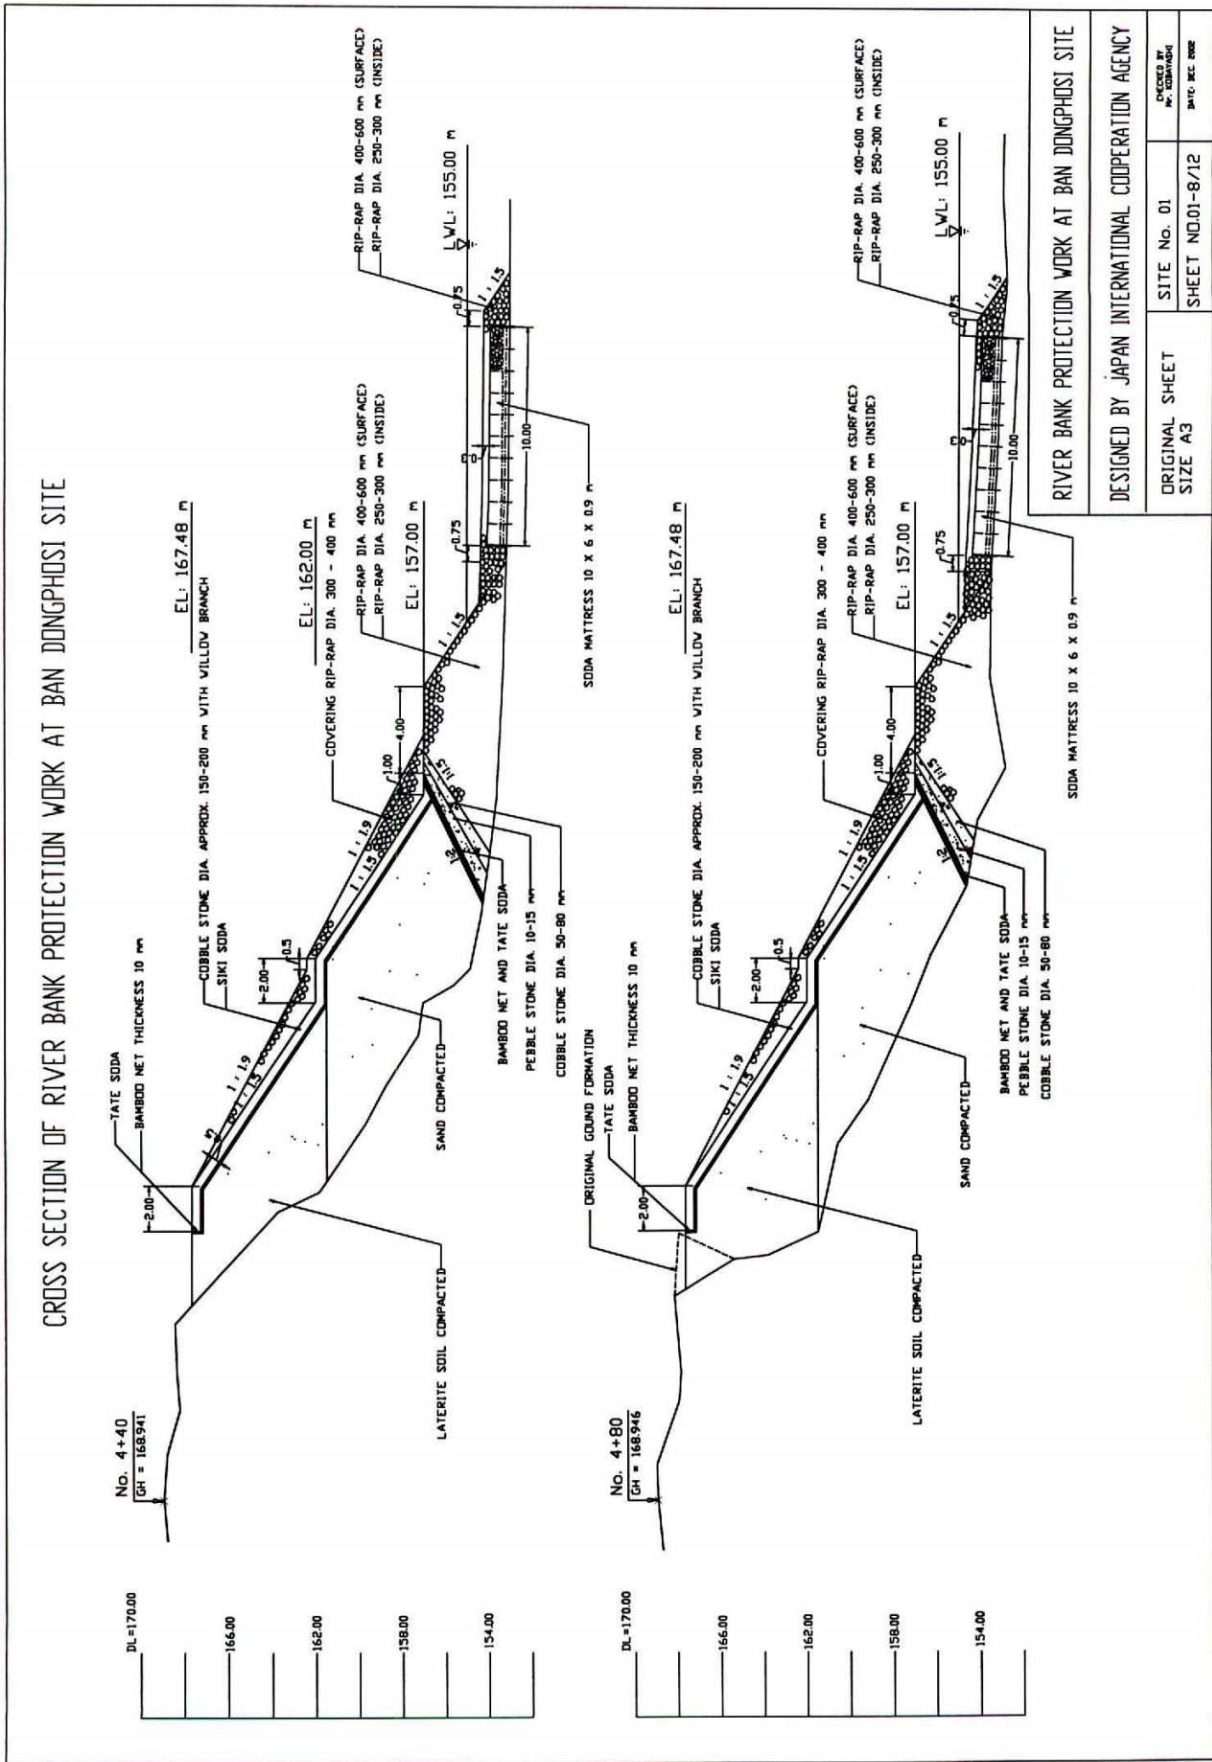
(5/9) Cross Section of River Bank Protection Work at Ban Dongphoshi Site
